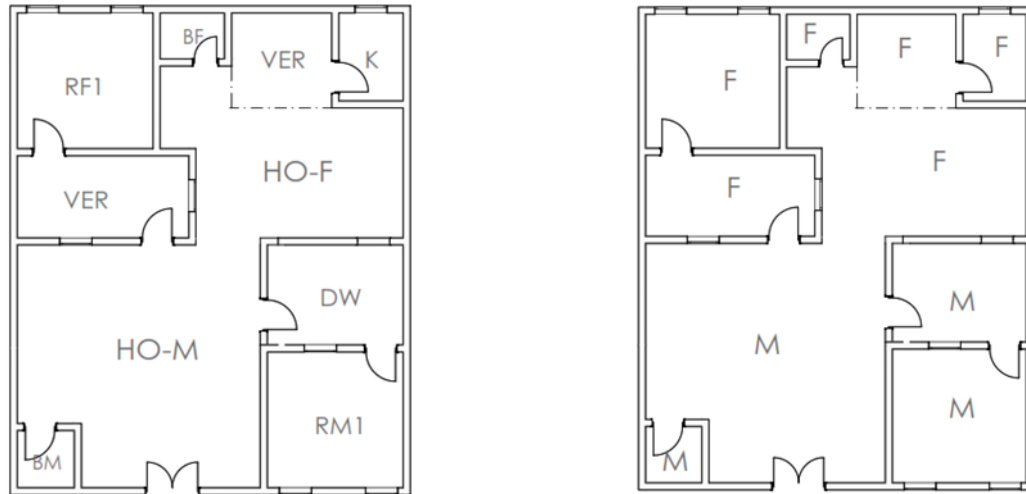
Case 9 - Layout Plan and the Male & Female Domains Layout
